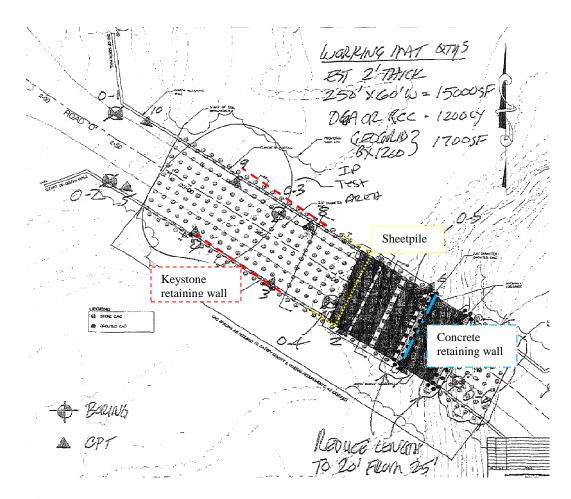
Lacrosse, NJ: Project plan layout (French Parrello Company)
